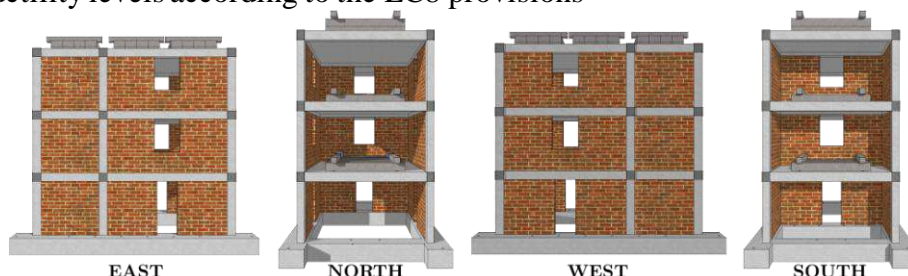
3 storey masonry-infilled RC frame and reinforcement details Lateral views.
